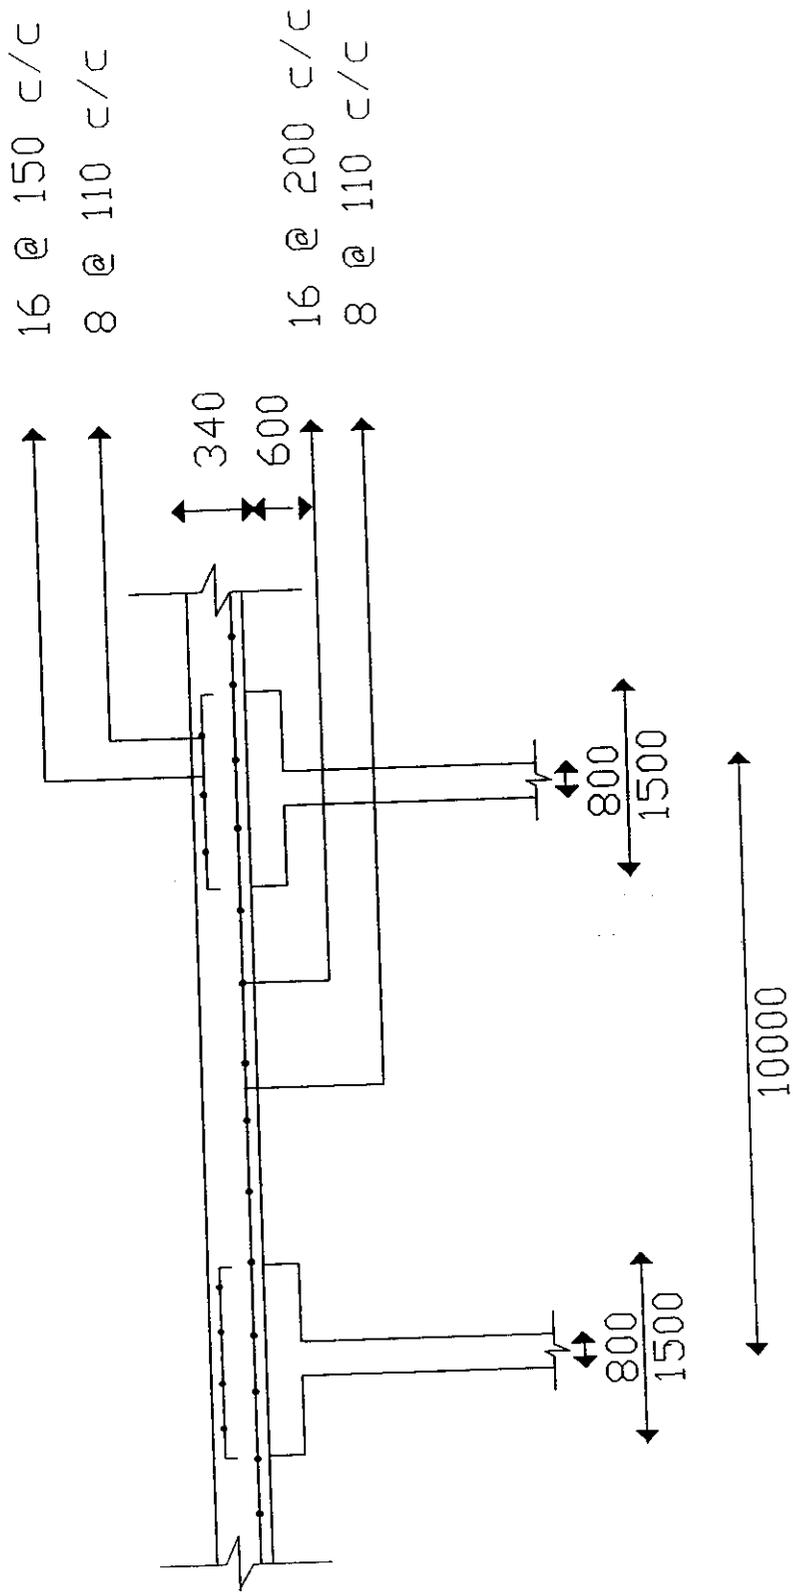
COLUMN STRIP SHORTER DIRECTION
